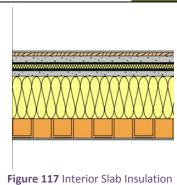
Interior Slab Insulation Detail - Villa Pobershau - 280 mm
